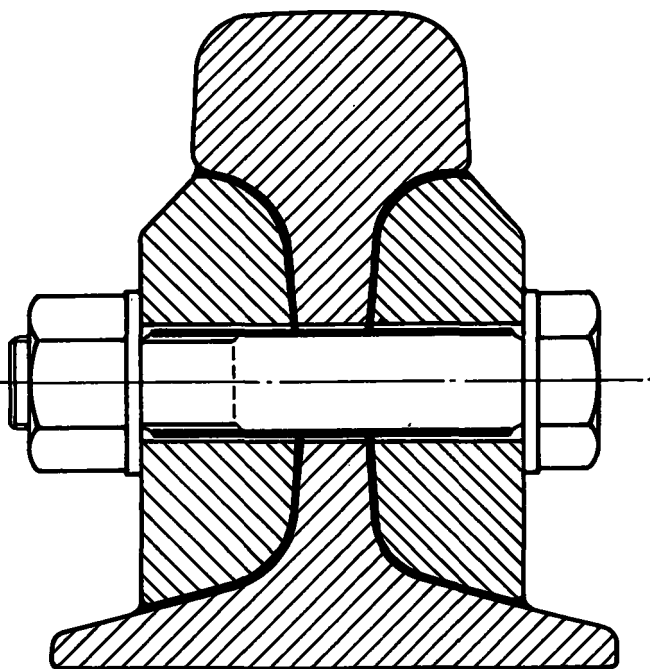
TYPICAL GLUED INSULATION JOINT ASSEMBLY
